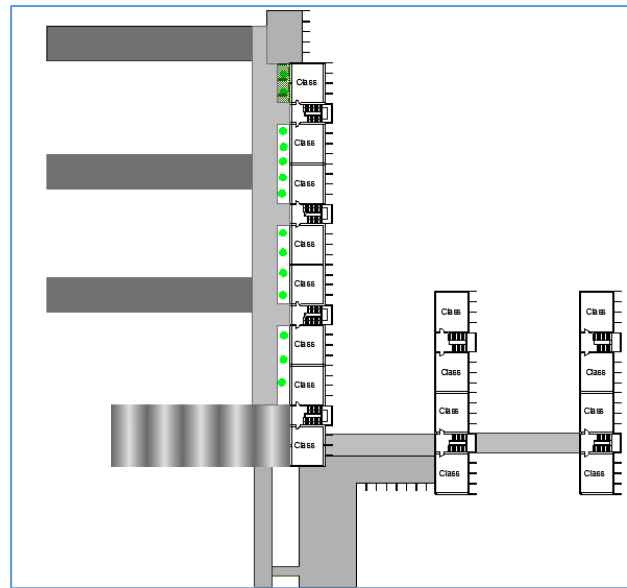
The First and Second Floor Plan for Lefkoşa türk lisesi (Drawn by Author).
